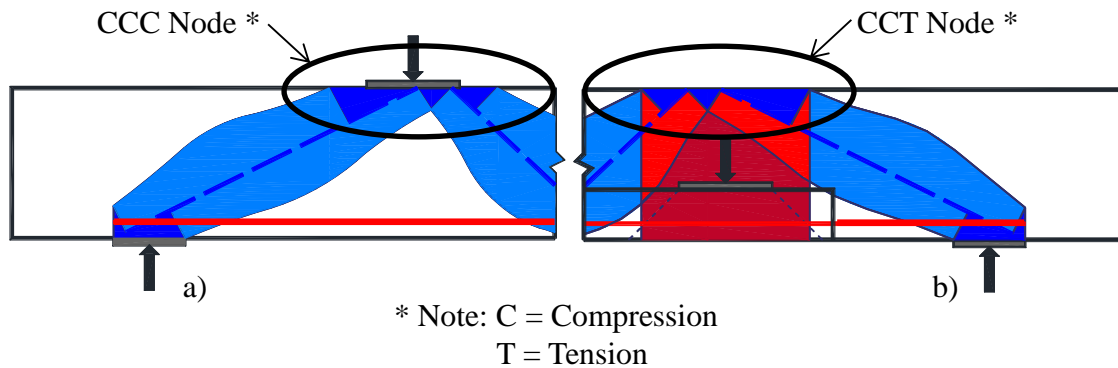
(a) Compression-chord loaded beam, (b) tension-chord loaded beam highlighting in red the tension field induced by the bottom loading
